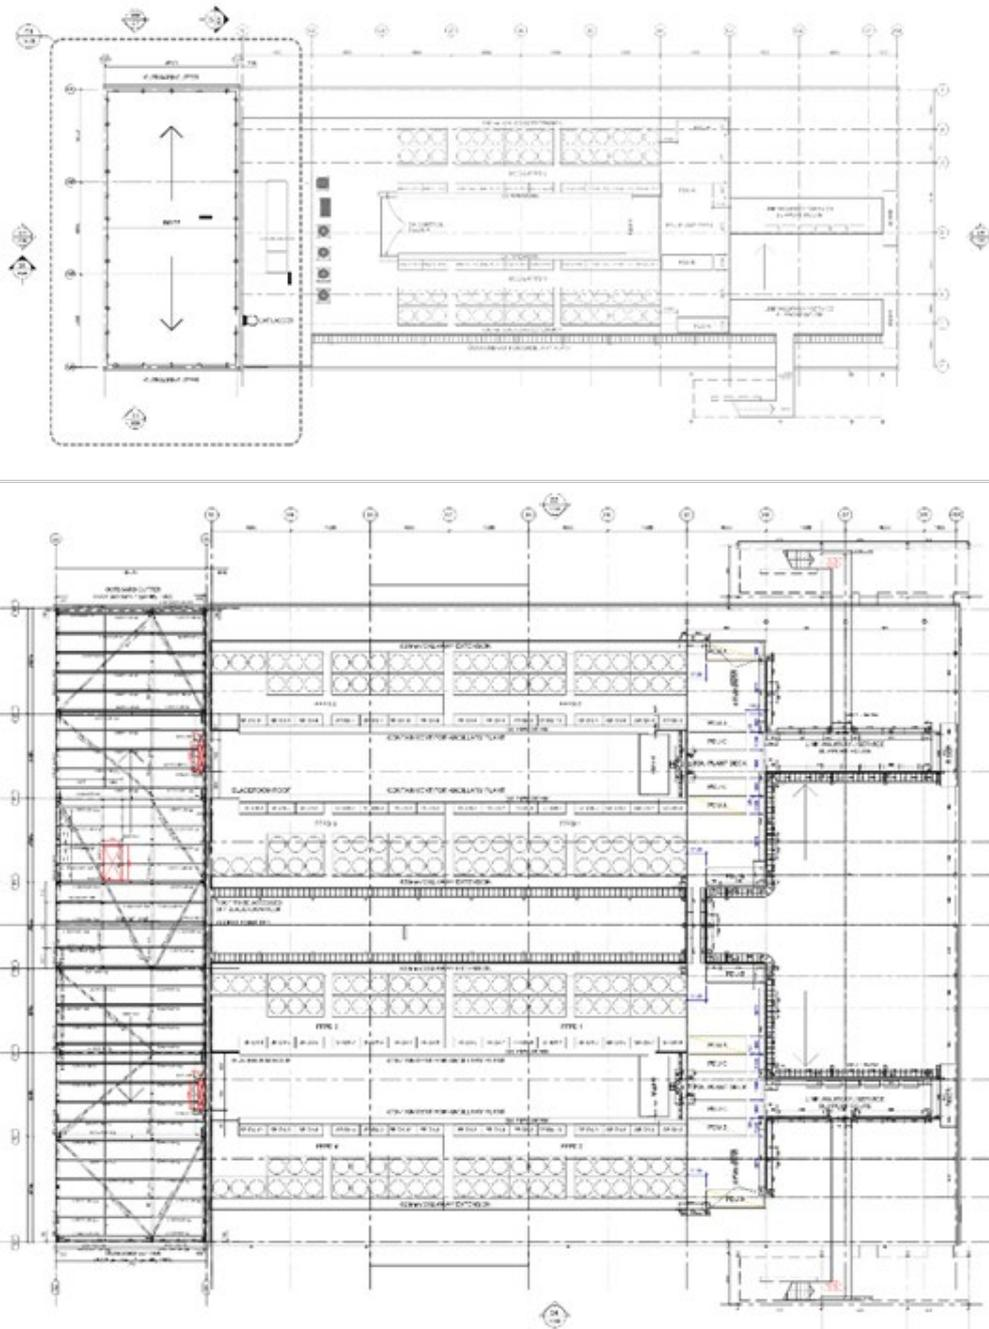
P3 Modules 1, 2 and 3 Roof Plans
